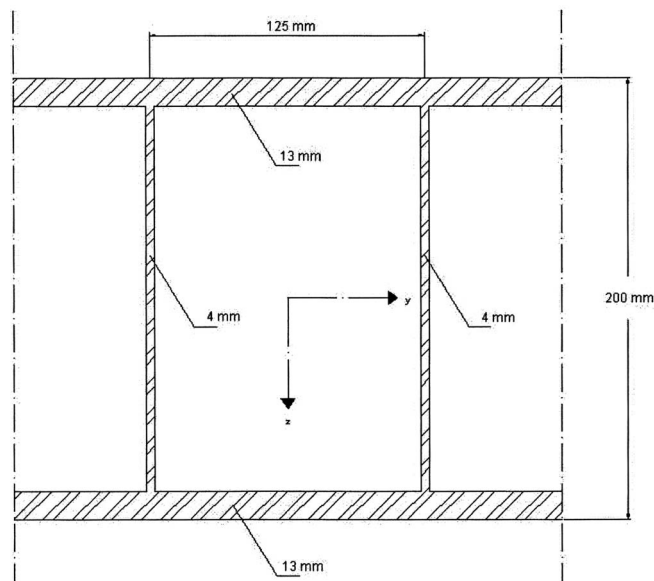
Possible wall cross-section for a safety factor of 5.0
